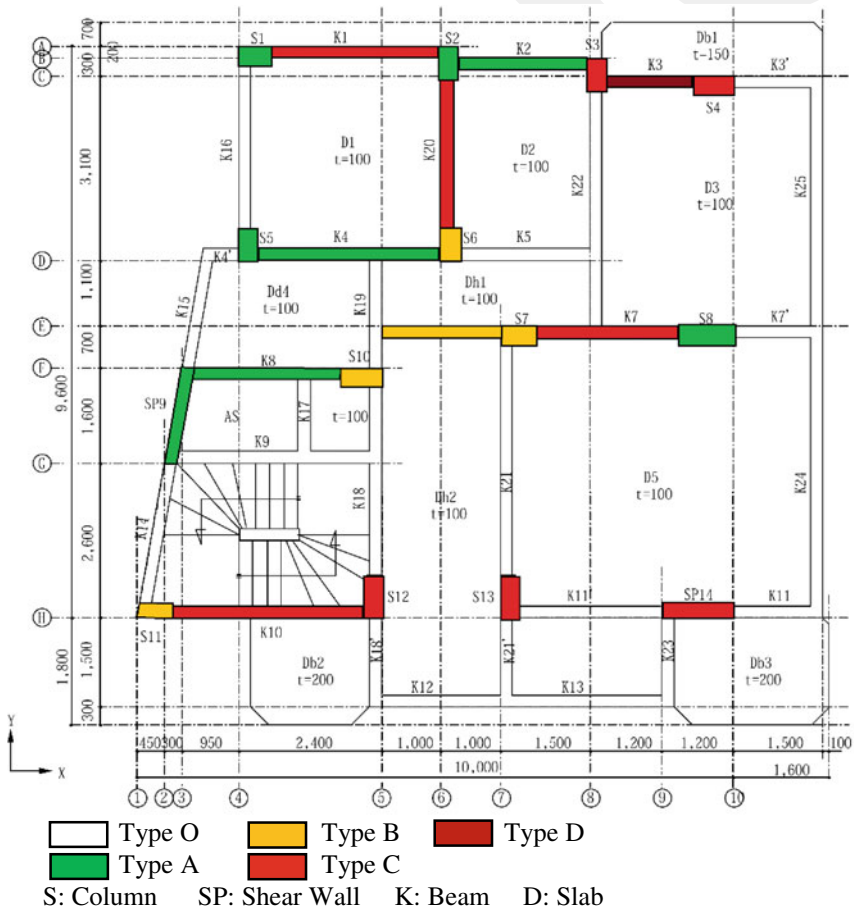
Damaged structural members in the first story (mm) (Modified from (AIJ/JSCE/JGS 2001))
